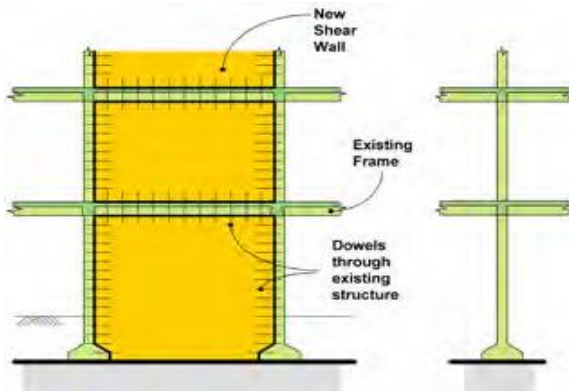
Installation of new RC shear walls in an existing RC frame building—note dowels provided to tie the new and the existing structure (source: WHE-2006-03, 2006).
